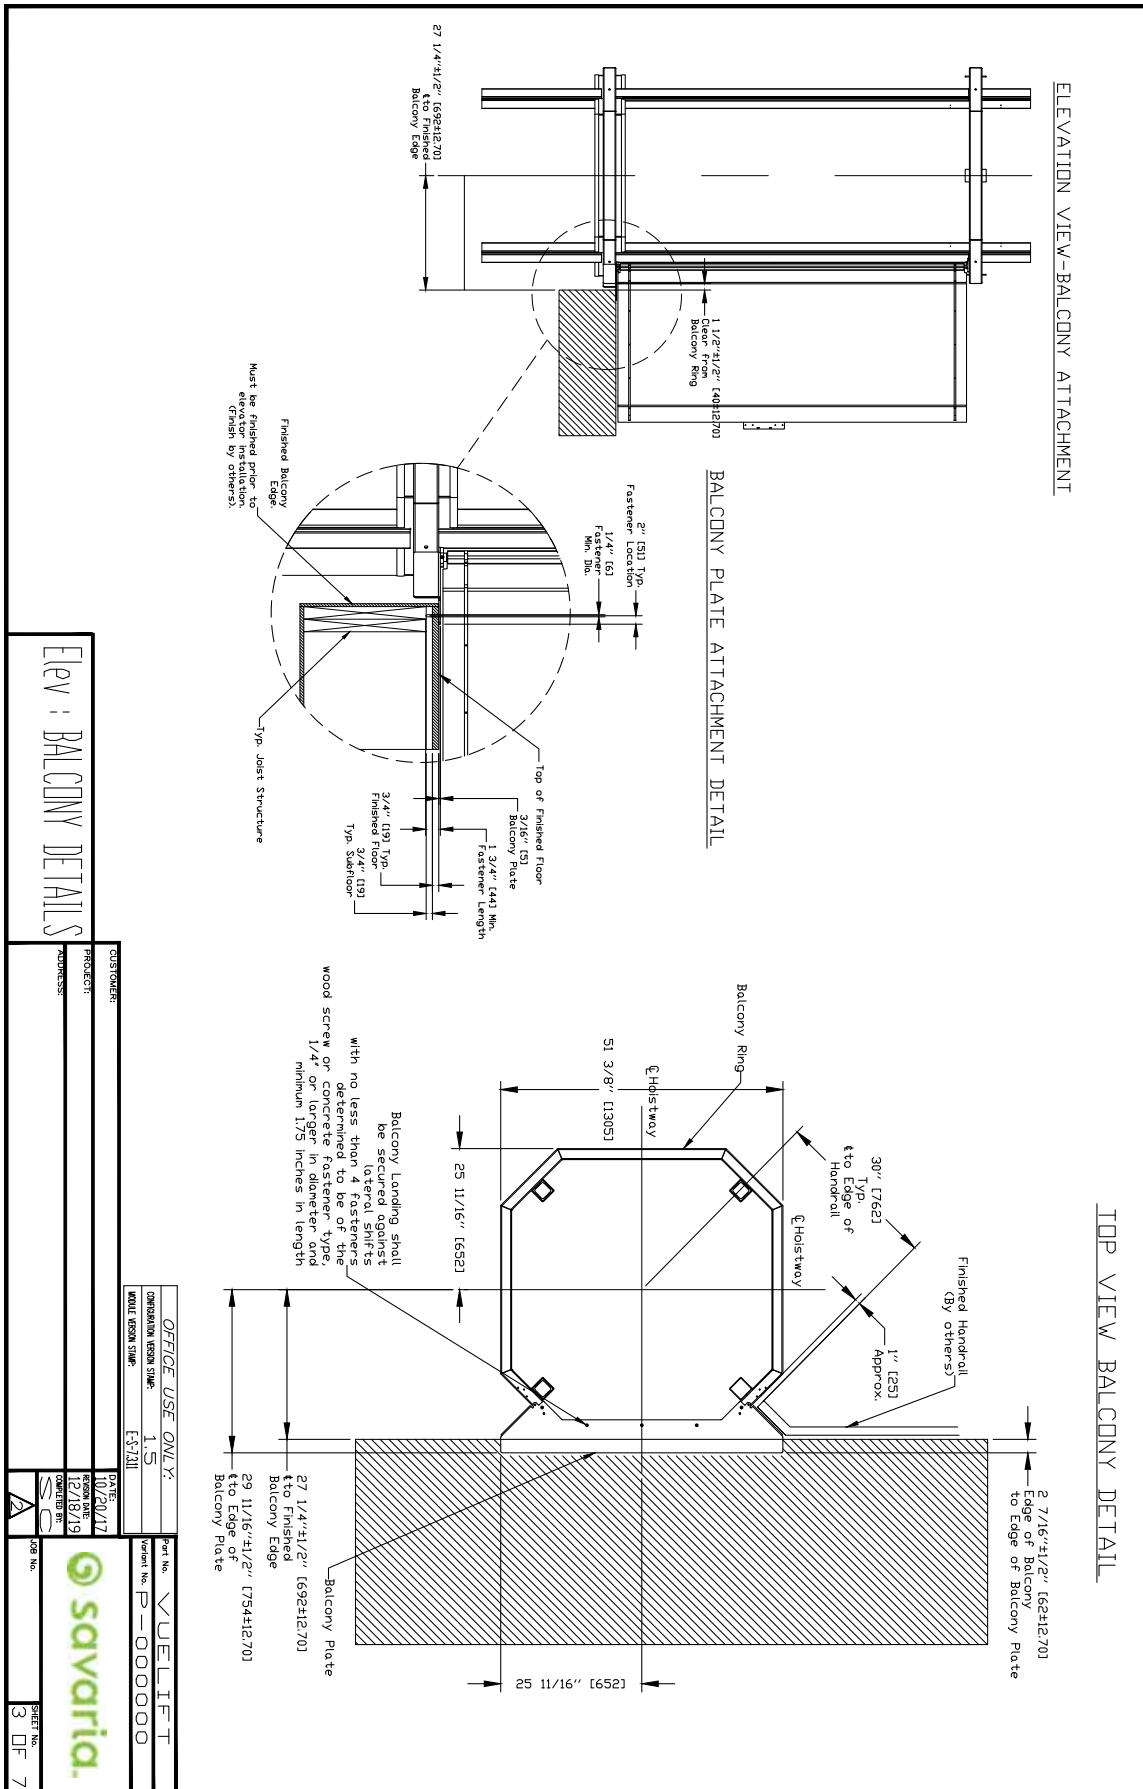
Balcony plate and handrail information - octagonal acrylic (OAM) type 1
